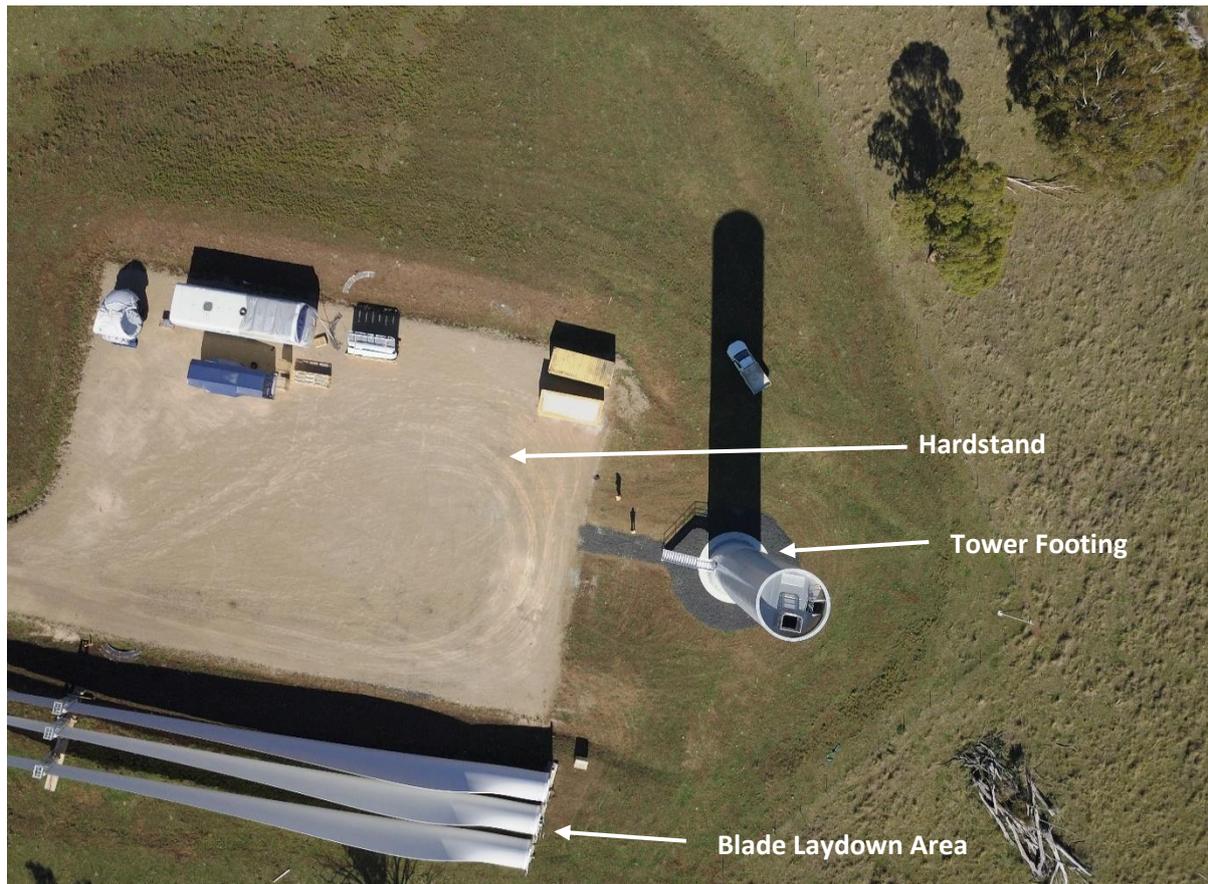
Hardstand, tower footing and blade laydown area at Sapphire Wind Farm
